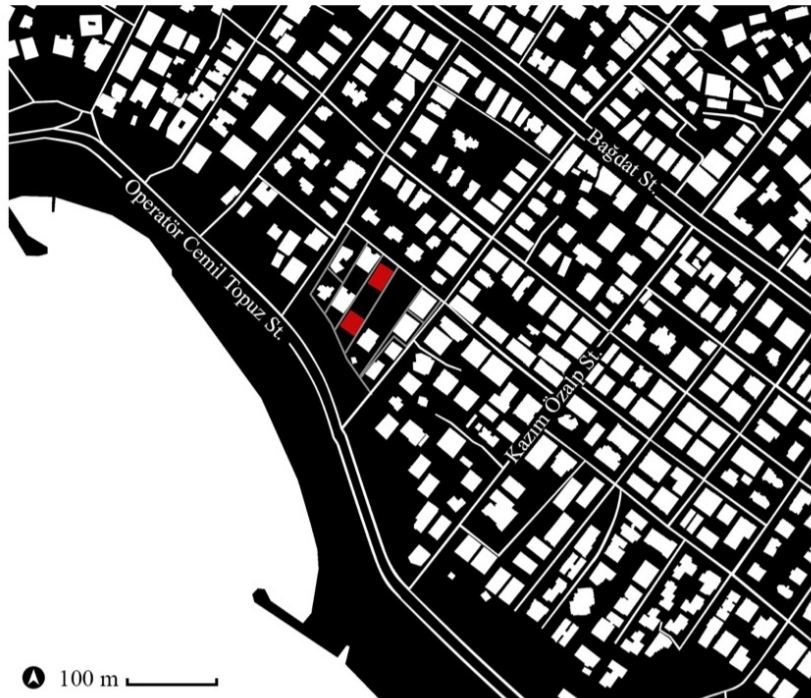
Case C Site Plan (Arolat Archives, Author)
